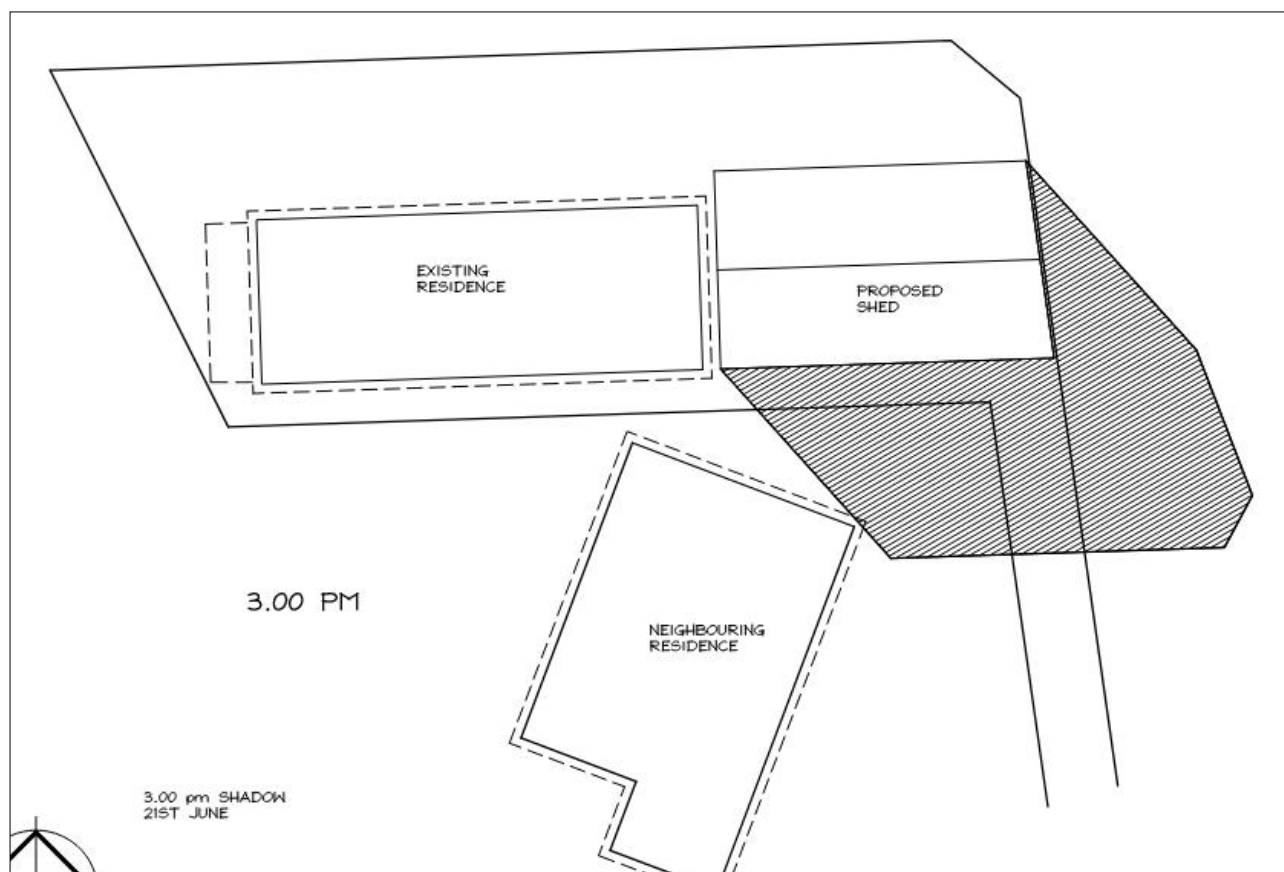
3pm shadow (Steven Penton Building Design, 2022)
